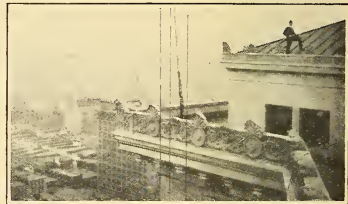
Hoist Cables Taken at Twenty-sixth Floor
